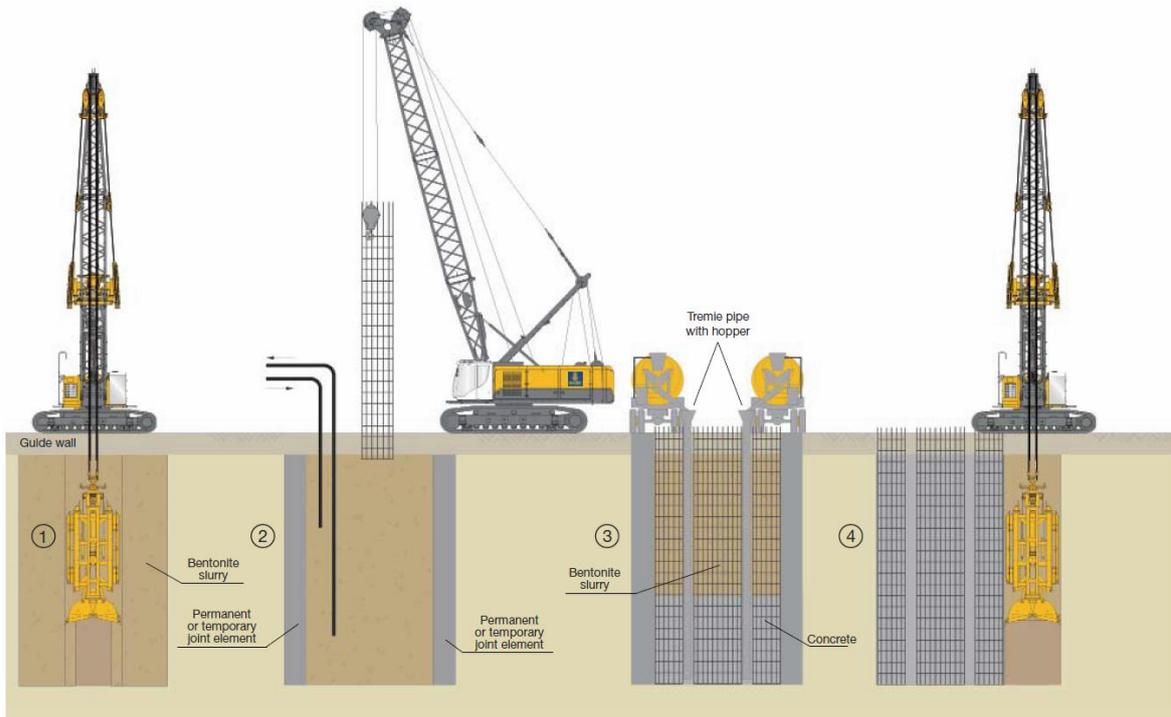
Two phase diaphragm wall construction sequence reinforcement cage (Bauer)
